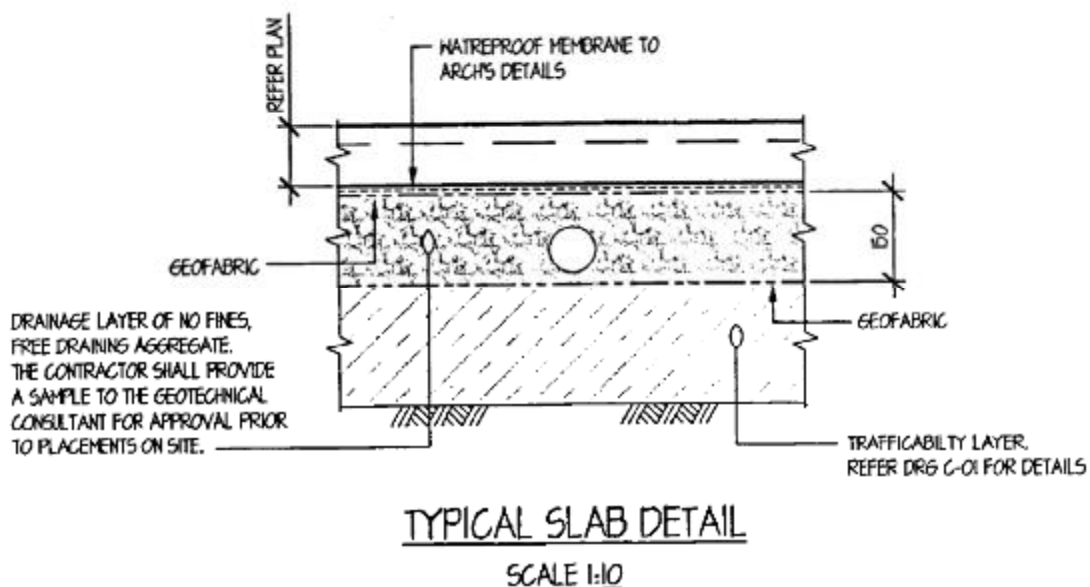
Extract of the Basement Slab Plan showing the slab/subsurface detail
